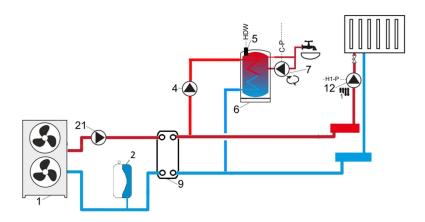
Diagram with a plate heat exchanger and DHW tank;
